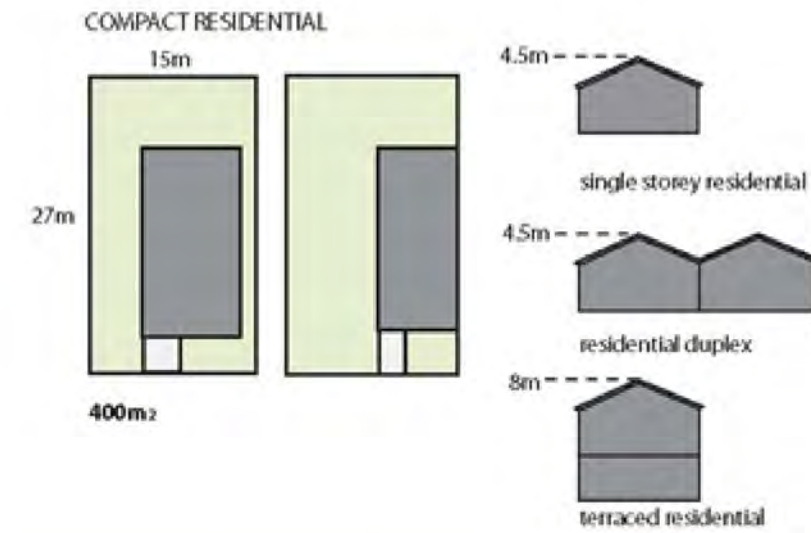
Typical lot layout and building form for compact residential lots (400m²) – Area A
